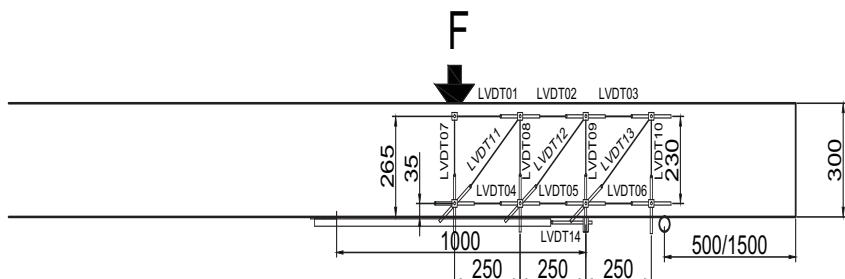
LVDT layout and numbering for 300 mm deep beams
